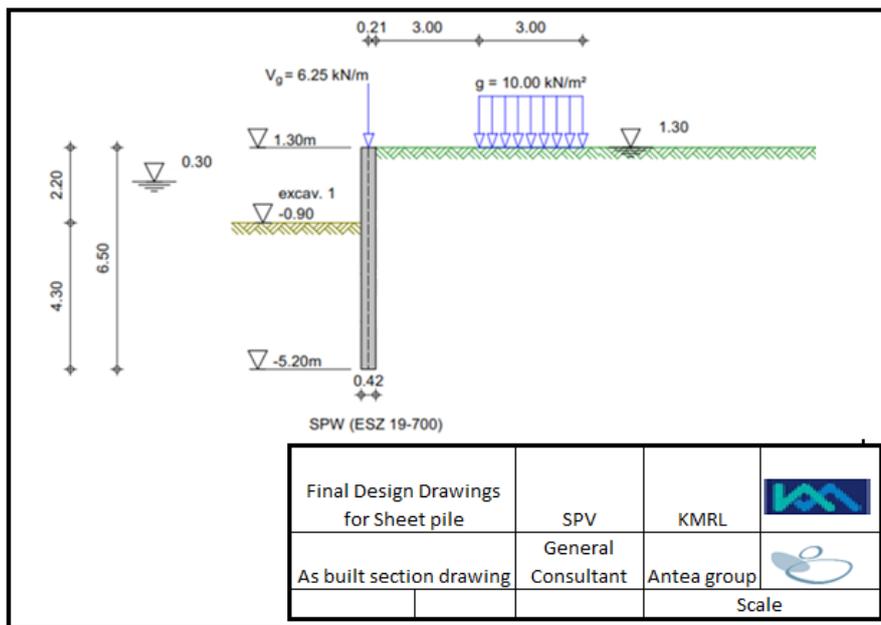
A.8: Final As built design section for the sheet pile under IURWTS canals
